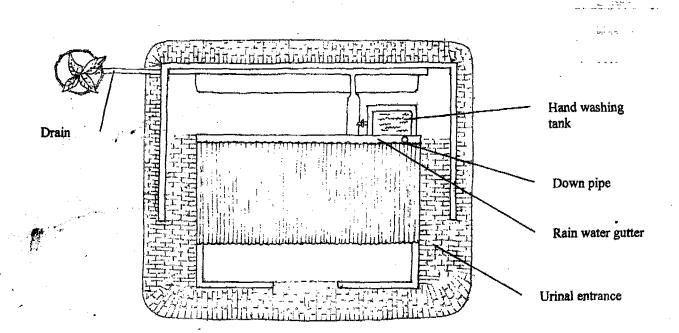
Floor plan of integrated latrine with rain water collection, hand washing facilities and urinal
